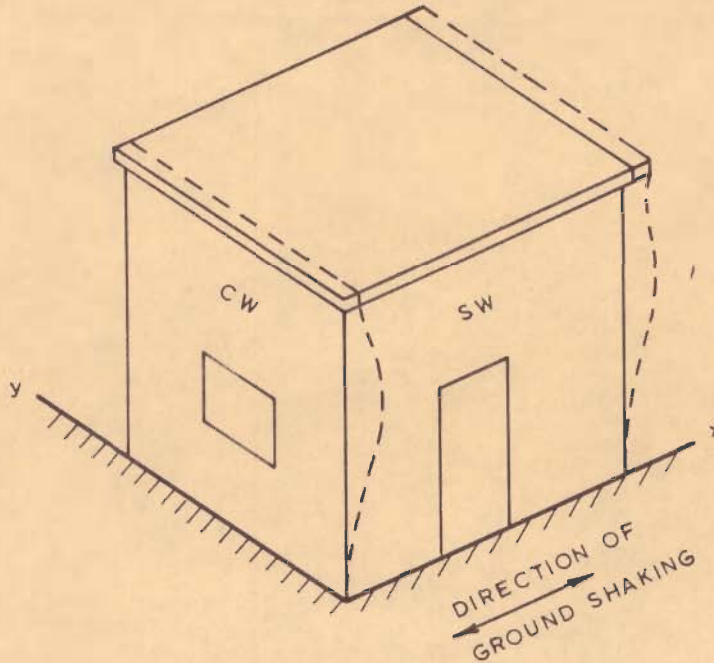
SCHEMATIC VIEW OF A SINGLE-STOREYED BUILDING
